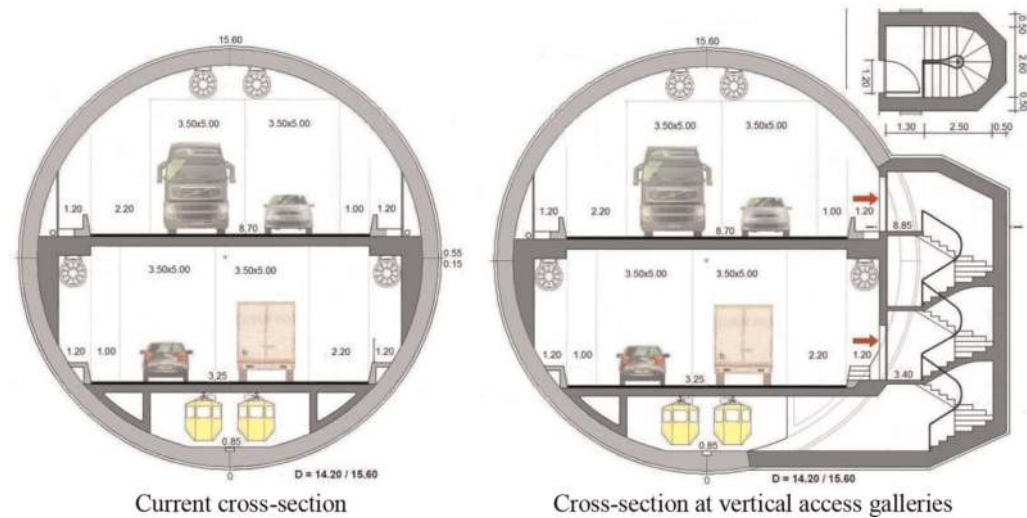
Optimized TBM tunnel alternative. Cross-section of the road tunnel.
